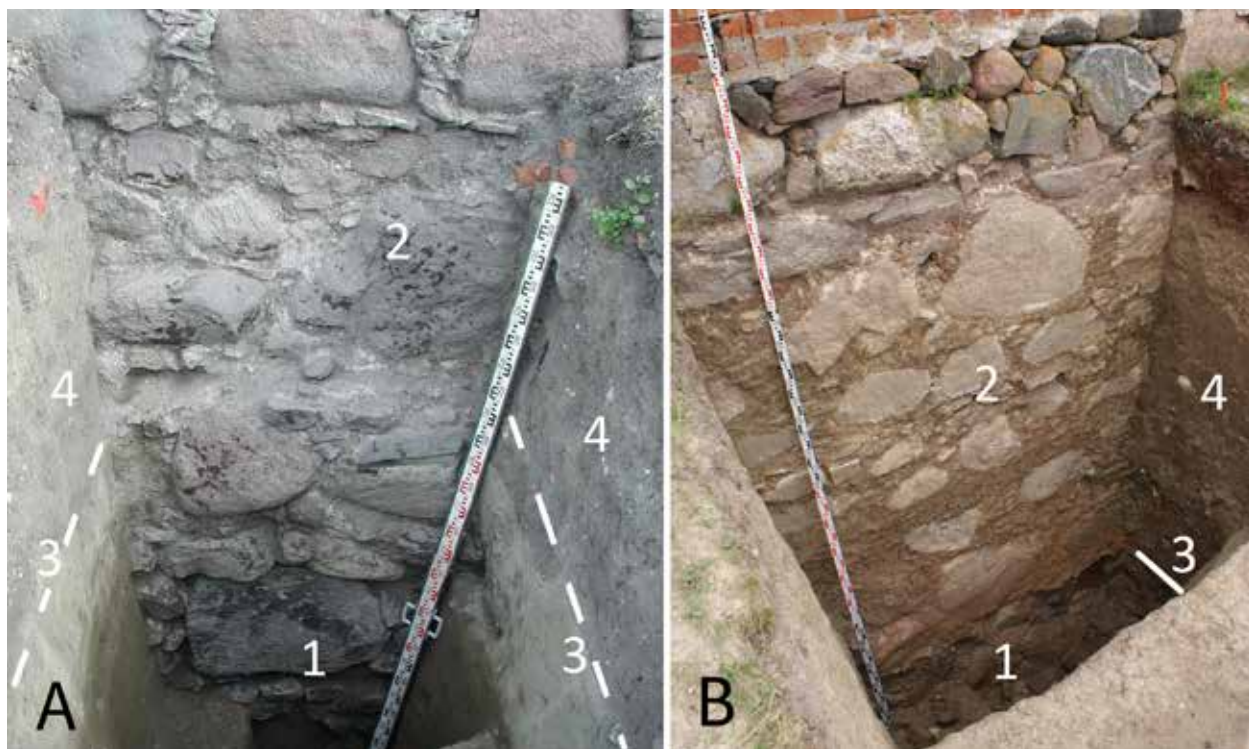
Castell foundation examples: A – Papowo Biskupie, B – Radzyń Chełmiński. 1 – foundation built in a narrow ditch without use of mortar, 2 – wall built above original ground level and then covered with an embankment, 3 – ground level from the period of building, 4 – building embankment. Photo M. Wiewióra. – Abb. 14. Die Beispiele der Bauwerkenfundamenten: A – Papowo Biskupie, B – Radzyń Chełmiński. 1 – Fundament in einem engen Graben ohne Verwendung von Mörtel, 2 – Mauer über dem ursprünglichen Boden gebaut und dann mit einer Aufschüttung bedeckt, 3 – Terrainsniveau aus der Bauzeit, 4 – Aufschüttung. Foto M. Wiewióra.
